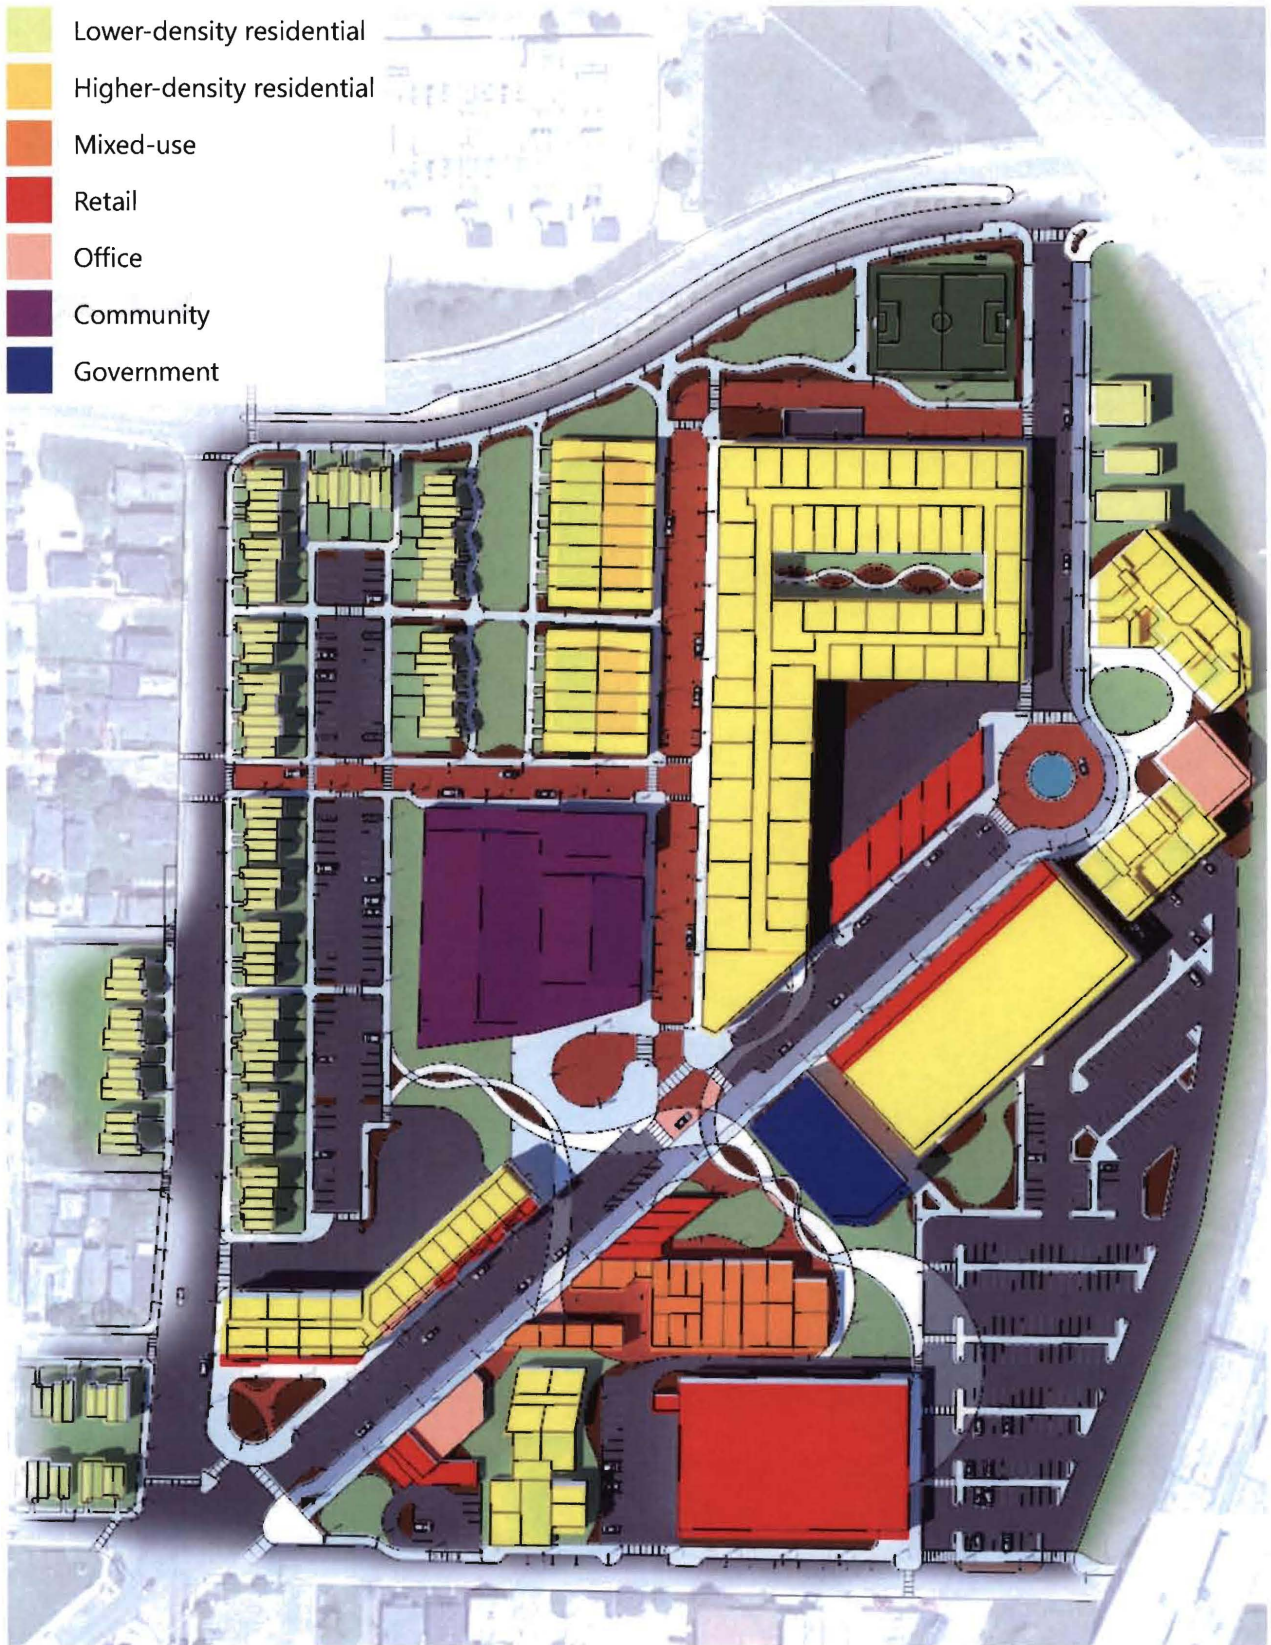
The proposed site plan. Building uses are indicated by color. Lines drawn atop buildings represent the separation of units.
